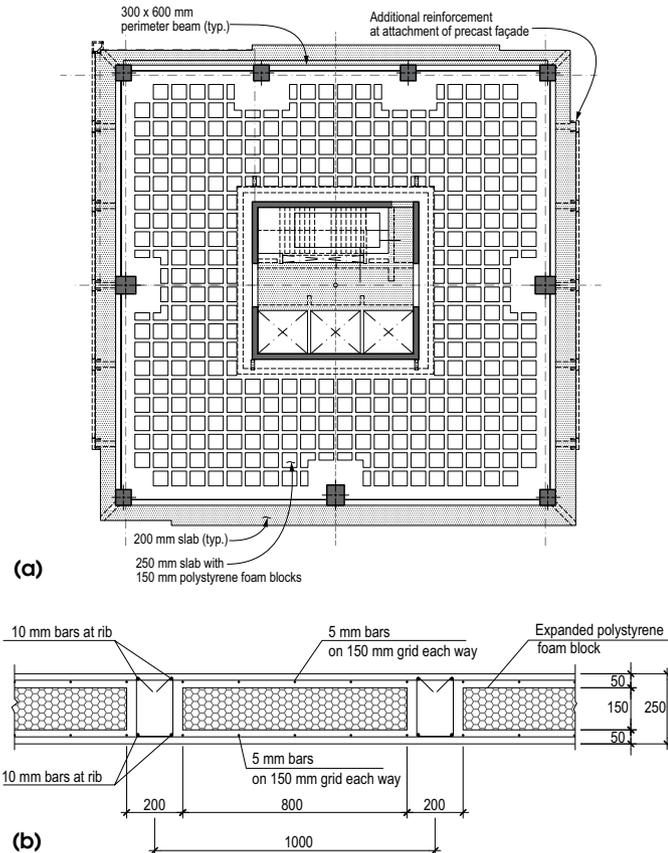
Structural drawings for the two-way PT concrete slab: (a) plan view showing border beam and central core; and (b) cross section of ribbed slab
